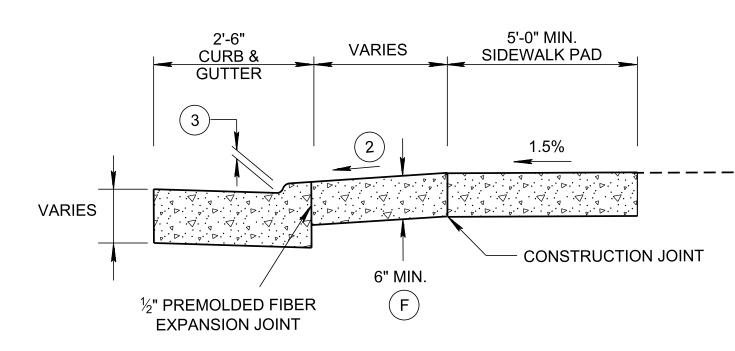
DETAILS OF LOWERED STANDARD CONCRETE DRIVEWAYS
